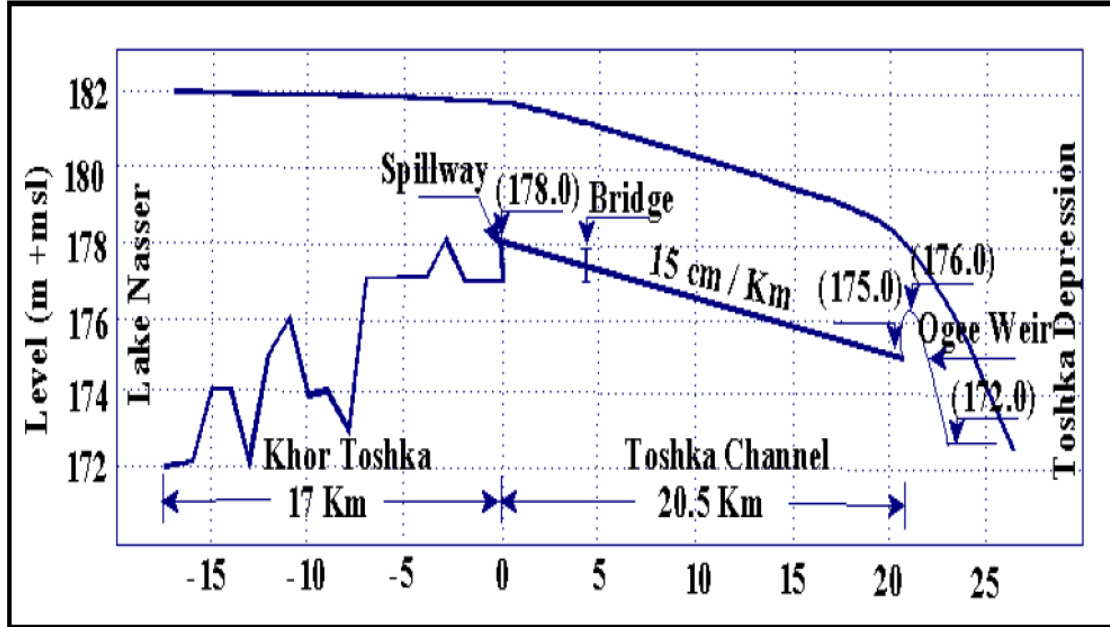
Longitudinal sections through Toshka spillway [Source: NBCBN, 2005].
